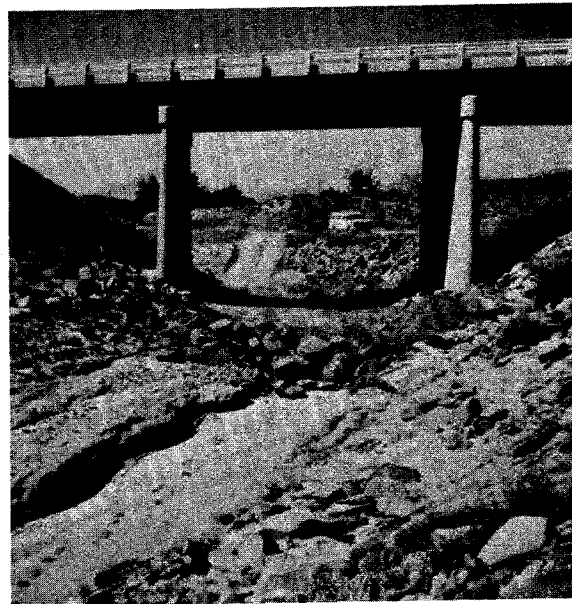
Placement of rock check dam downstream of bridge after flood in 1962.
